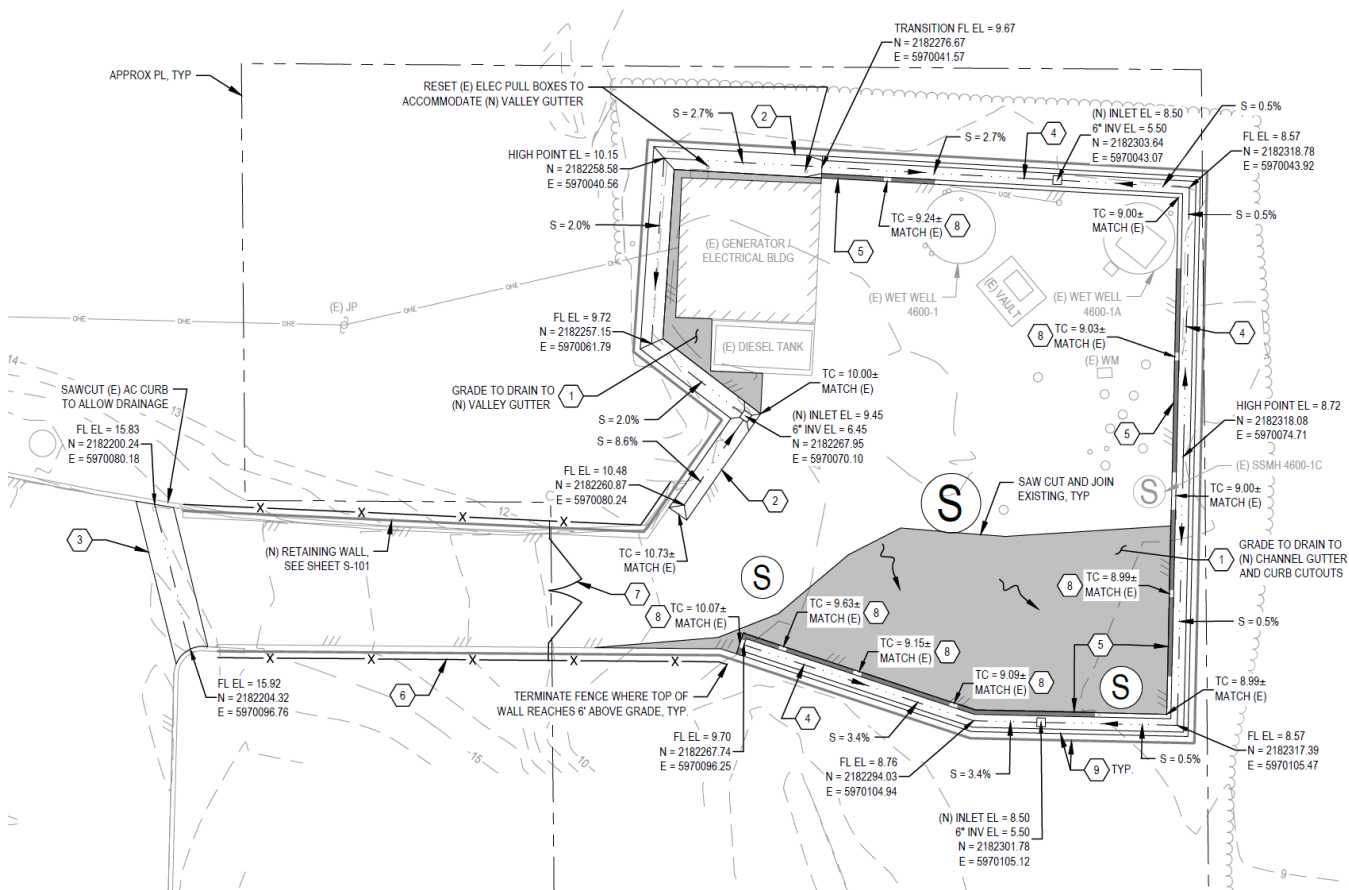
The figure shows the proposed grading and drainage plan within the interior of the new flood barrier system being designed for the Hoover Street Lift Station.
